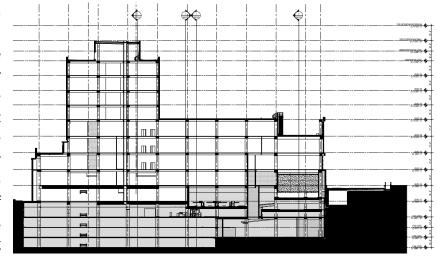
| Building Section Looking North (Courtesy of SmithGroupJJR)
